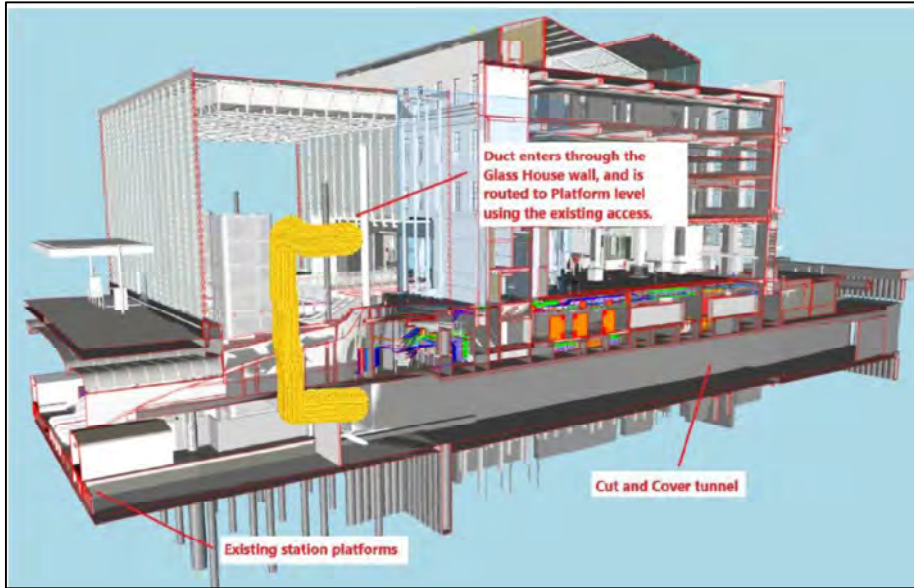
Ventilation ducting extending down into the tunnels on Tyler Street side
